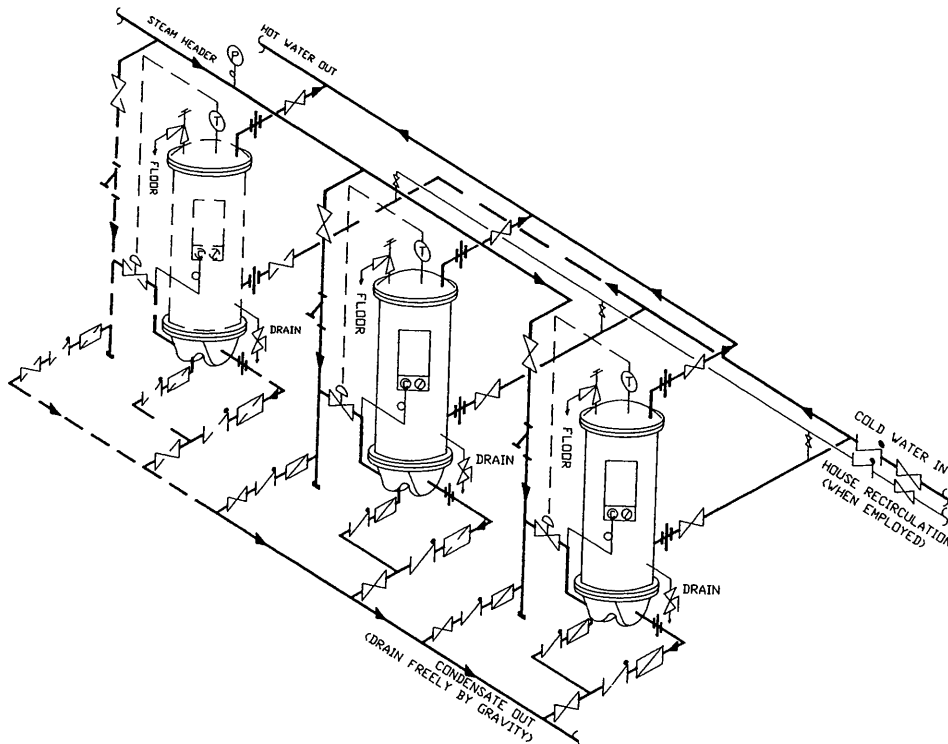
Piping Connections for Parallel Steam to Water Heaters
